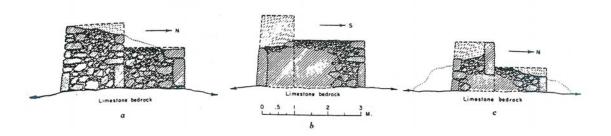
Three cross section drawings of various points along the wall showing parapet along the outside of the wall and walkway along the inside of the wall. Parapet most likely supported a perishable palisade for added height (modified after Shook 1952:Figures 1a-1c).
